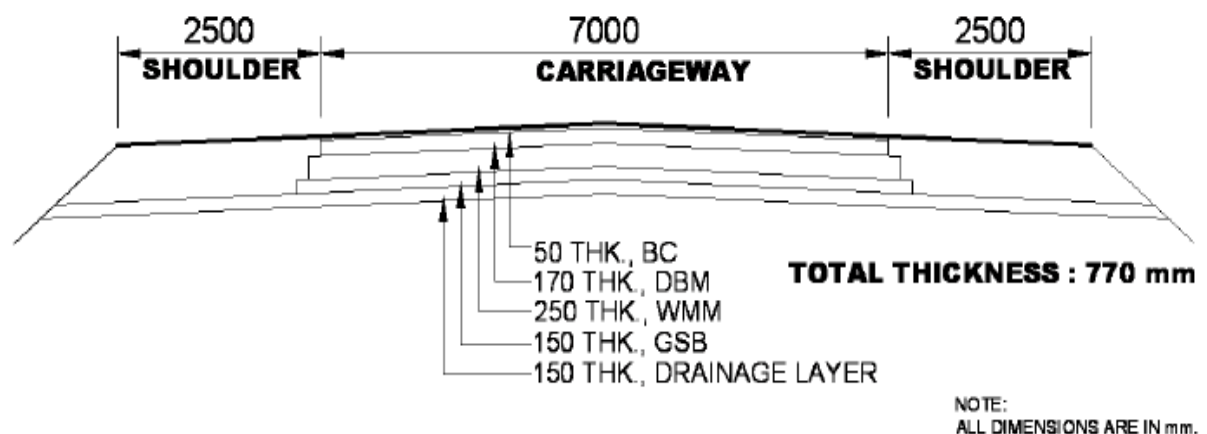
Section of Flexible Pavement designed as per IRC 37:2012
